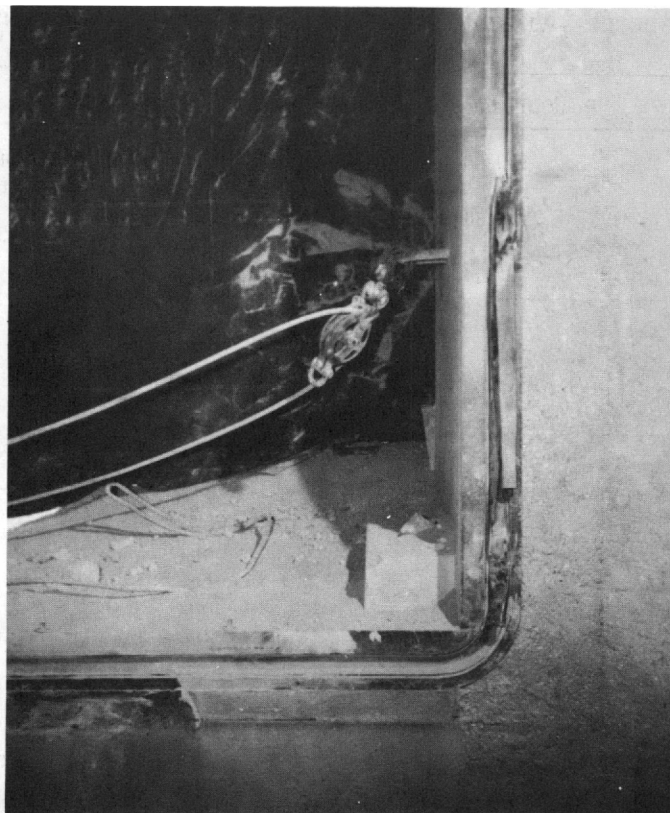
Damaged gasket at lower corner of door opening (postshot).
